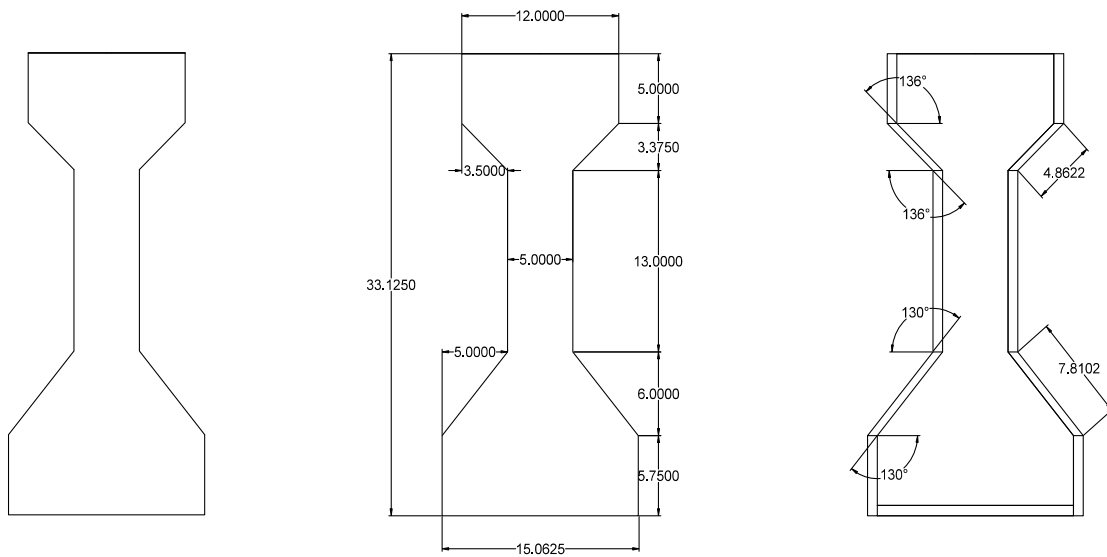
CAD drawing Sizing of Mini-Girders in (Inches)
